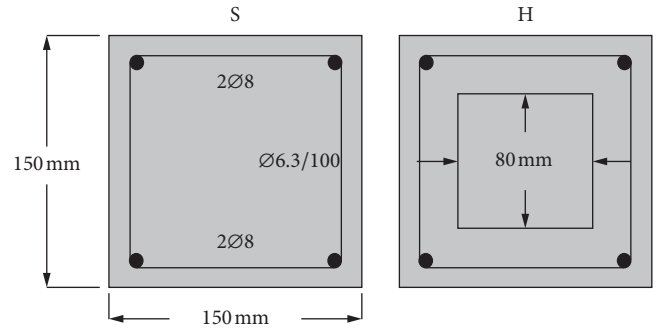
Sectional geometry and reinforcing details of the solid and hollow beams.
